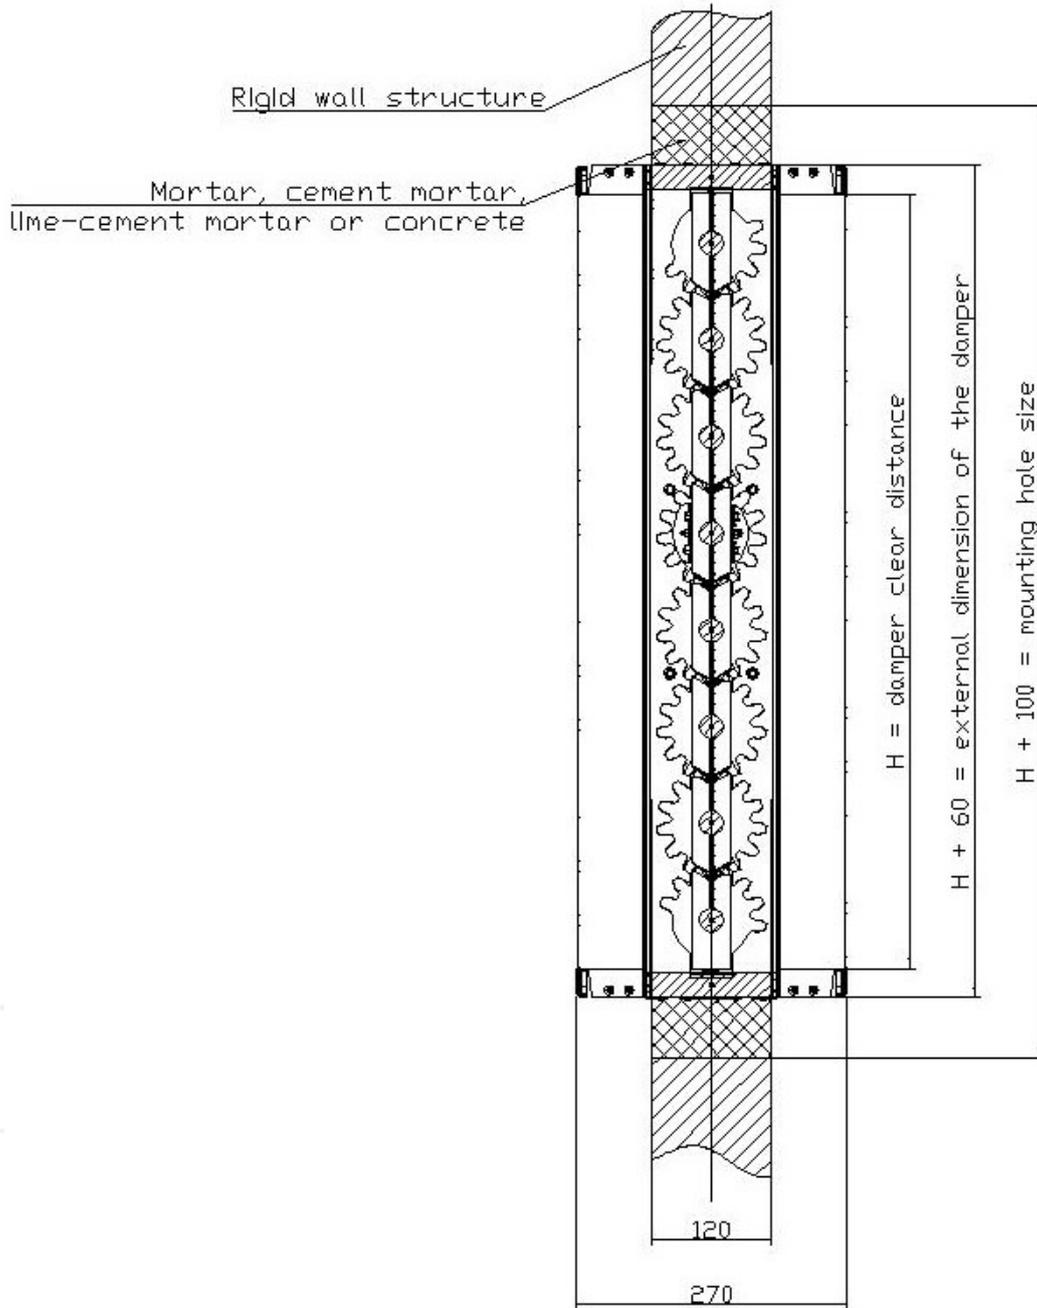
Installing method of WKP-O fire dampers in rigid wall.
